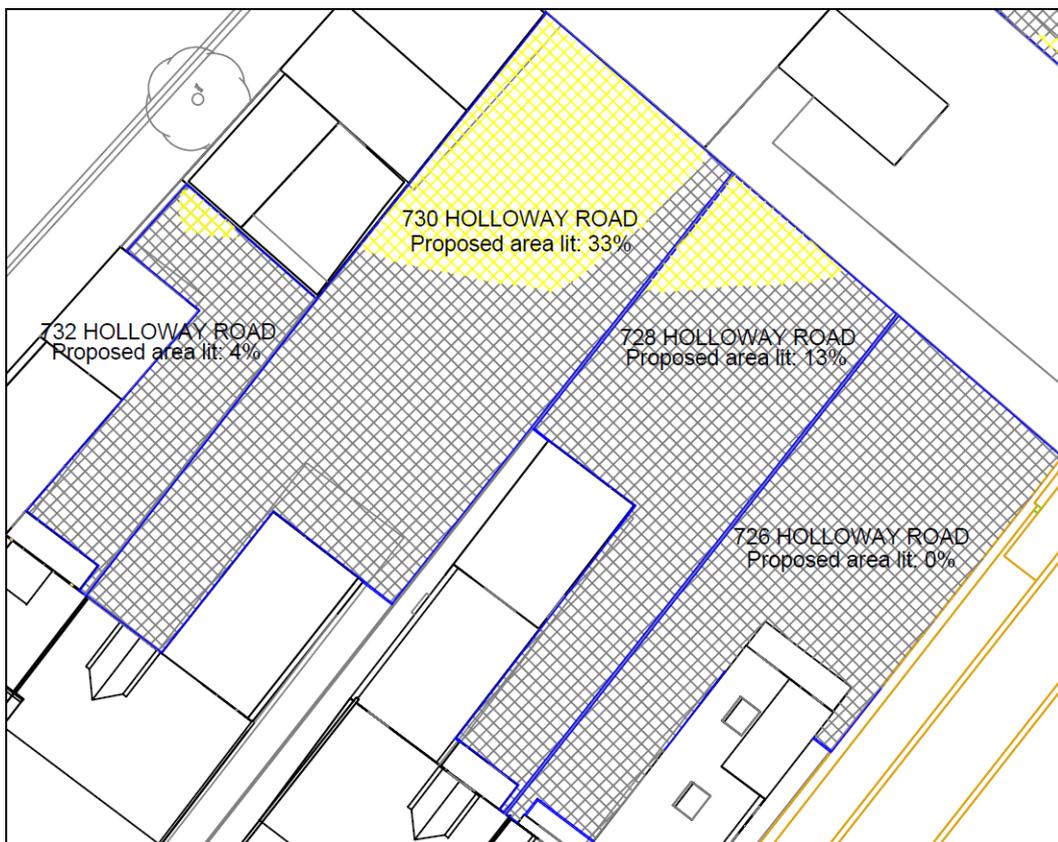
Proposed 'sunlight on ground' to neighbouring properties on Holloway Road.
